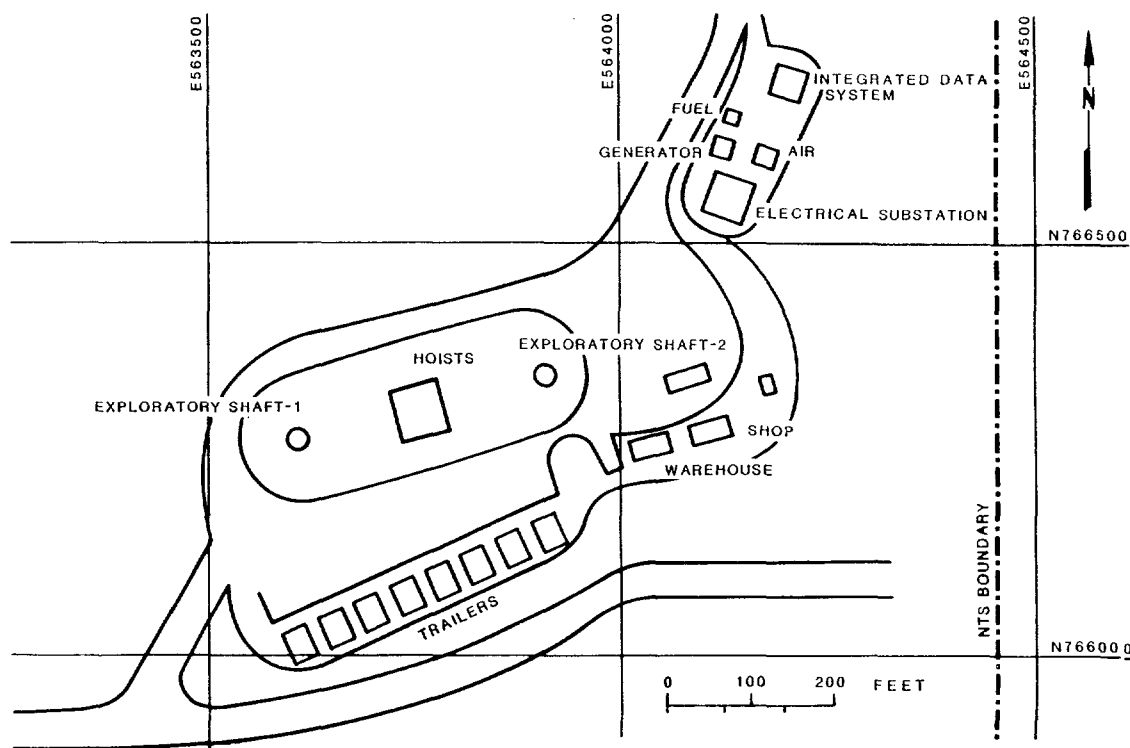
Conceptual surface layout for the site of the exploratory-shaft facility.
